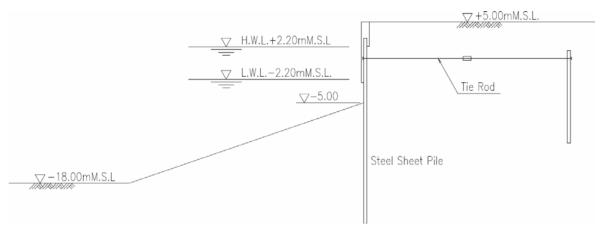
Sheet Pile Quay Wall (Standard Section)
